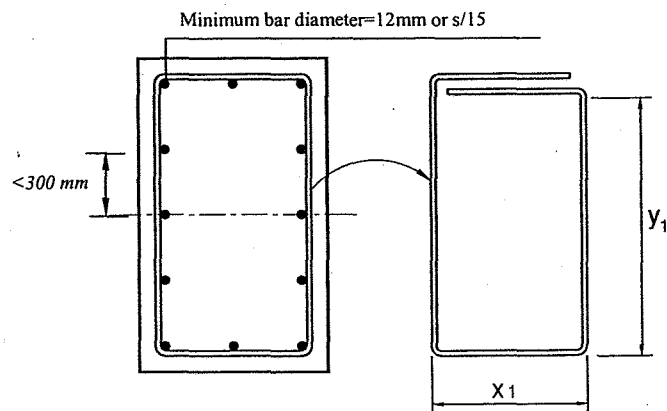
Torsion stirrup and longitudinal reinforcement details
